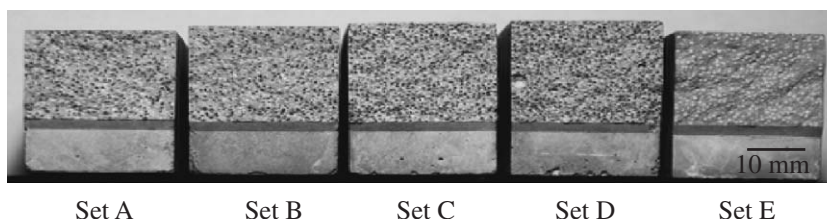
Typical fracture surfaces of mortar beams.
